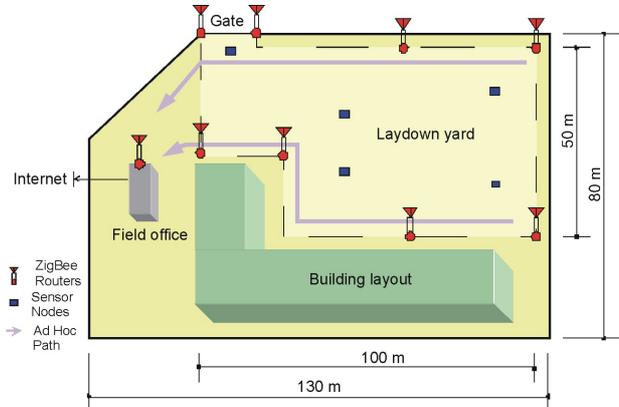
Possible application scenario for the material tracking and monitoring system on construction site
